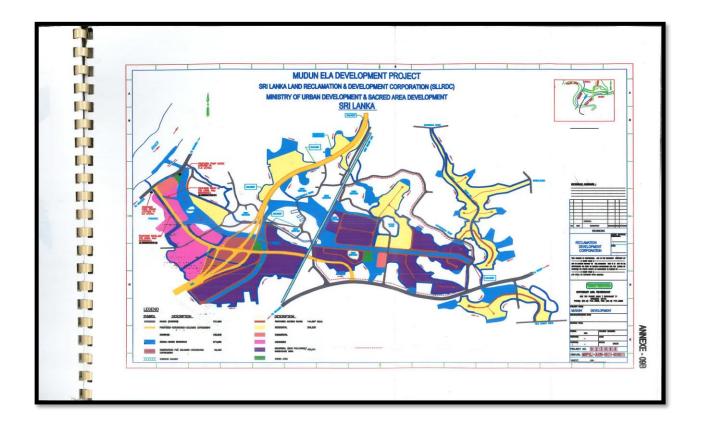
Storm water Master drainage plan for Mudun Ela watershed of the project site
